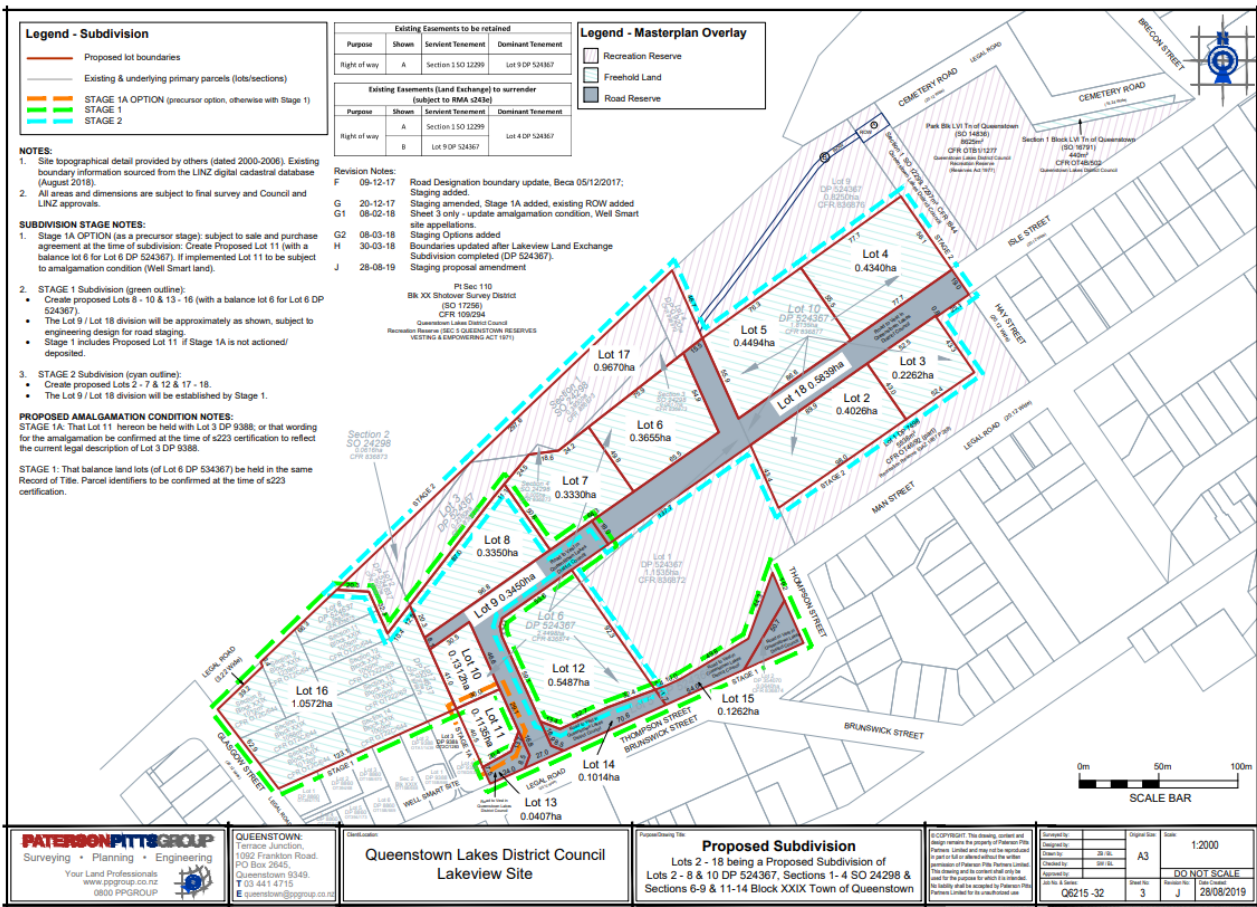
Proposed Subdivision Plan and Stages of Subdivision (Reference)
